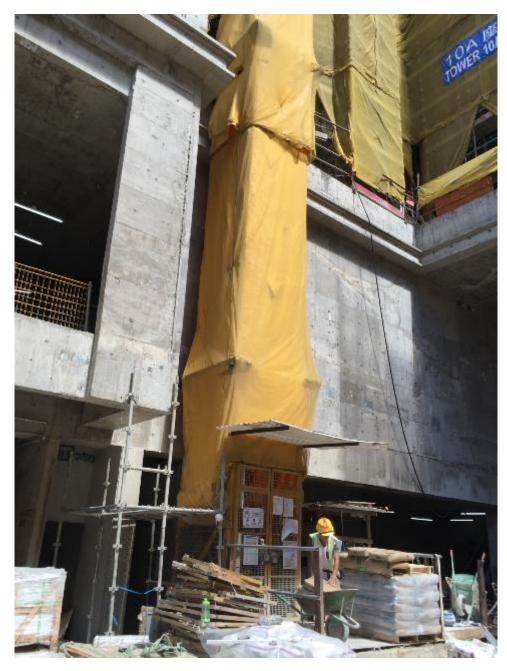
Use of Refuse Chute to Transport Construction Waste from Building
